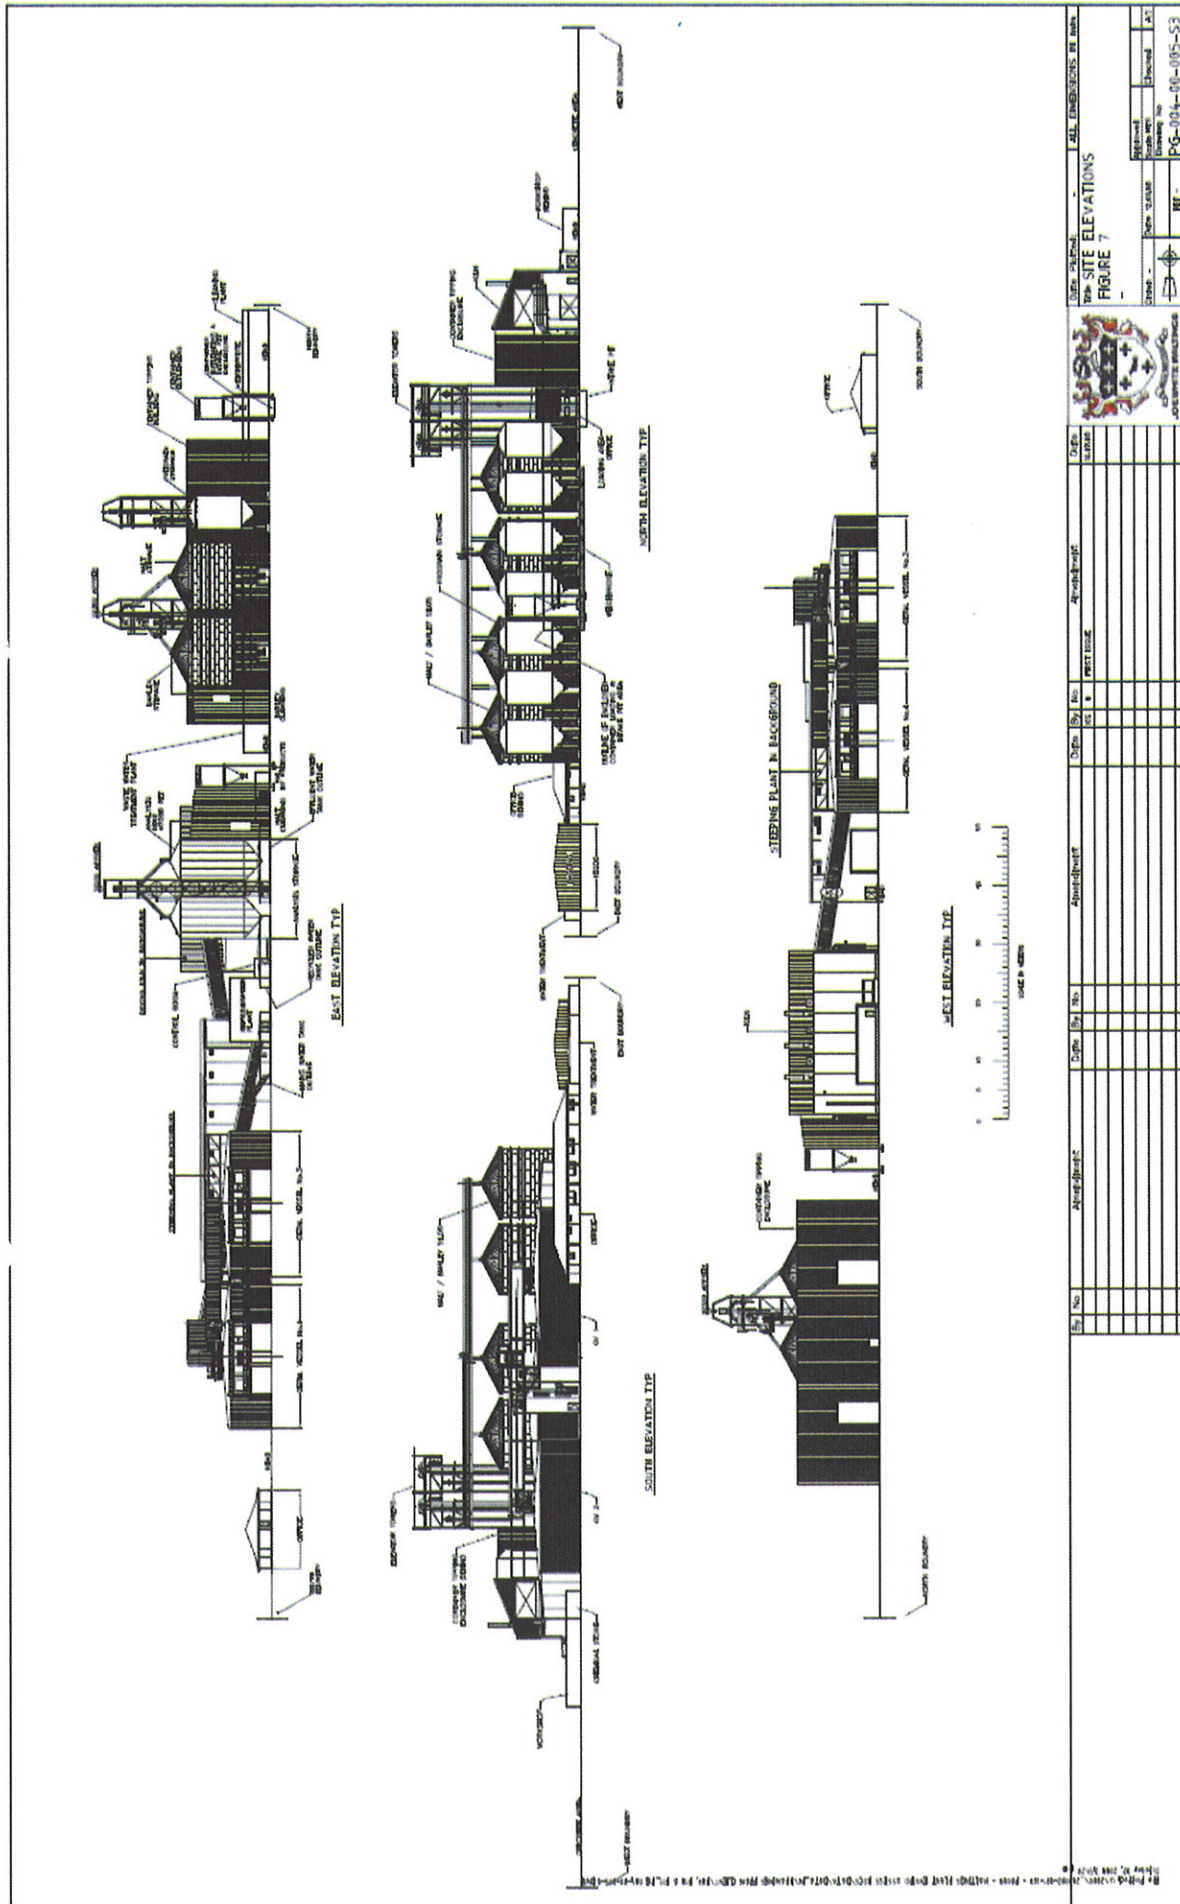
Proposed elevations plan (source: Cardno EA page 26)
